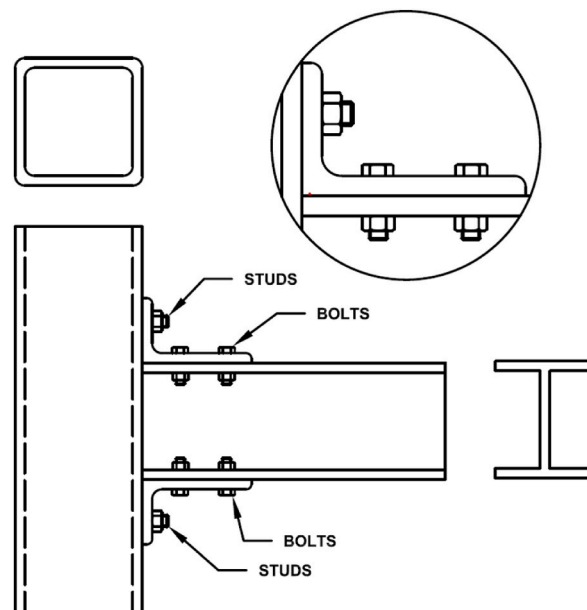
Example of an I-beam to tubular column joint with unequal sided top and seat angle cleats and welded studs.
